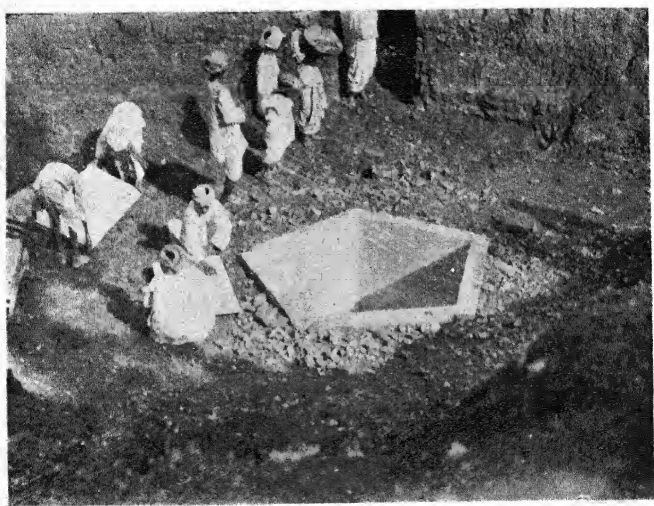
A well under cement concrete lining. Note the widening done in soft soil. Filling behind lining is done by boulders, but sometimes sand is used if available cheaper.
